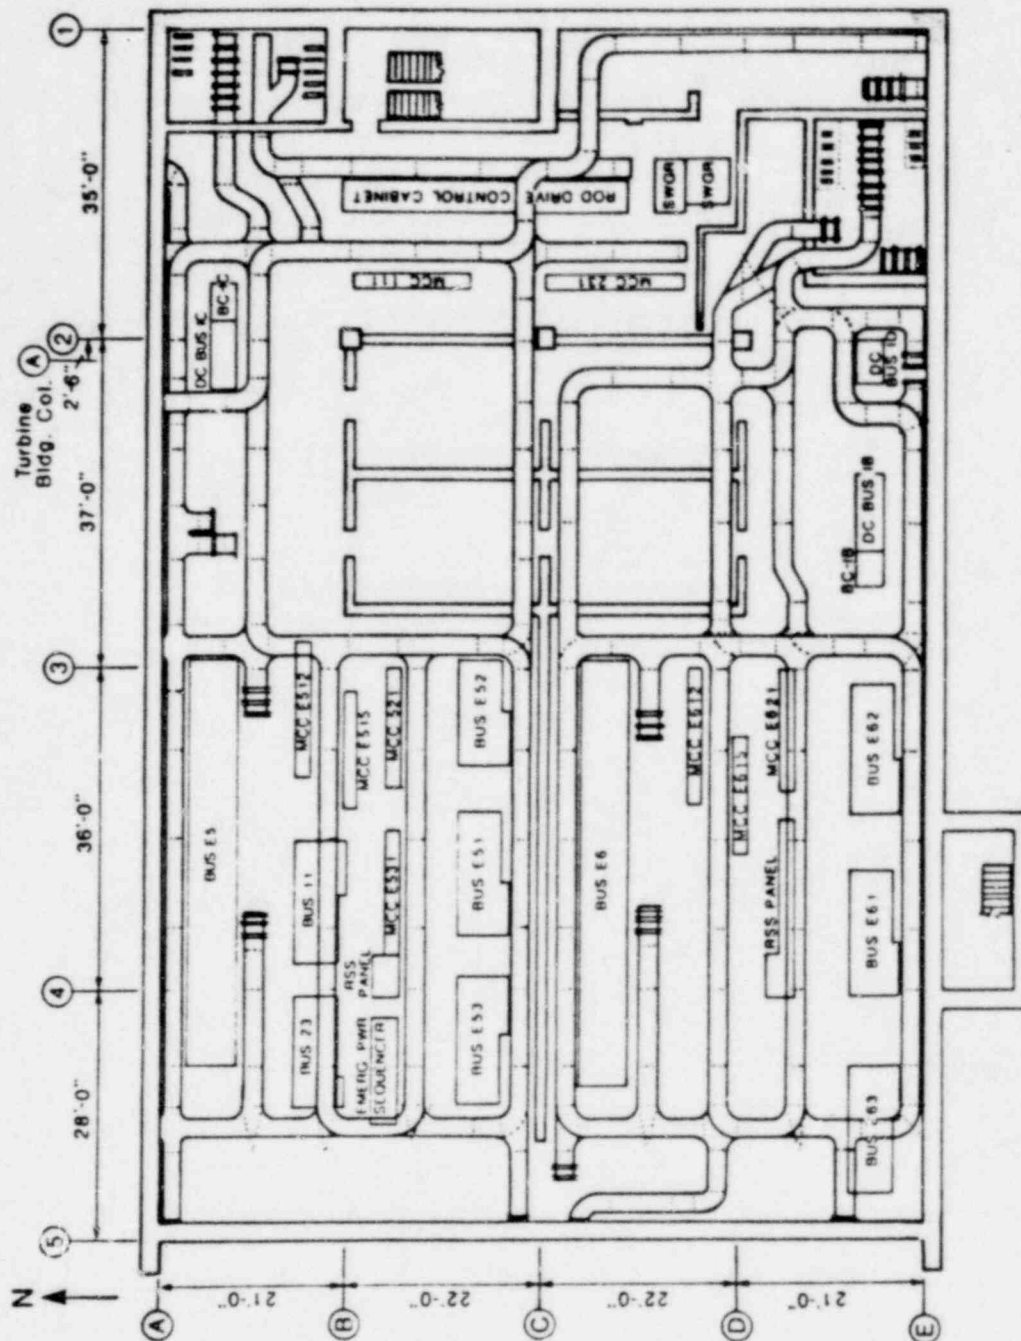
The typical configuration of cable trays in this area is a double trapeze with up to 8 tiers. The trapezes are connected to the ceiling using the standard connection "boot" either bolted or welded to overhead structural steel wide-flange beams. On multiple-tiered trays, at least every fourth tier is braced in the transverse direction. Bracing details include triangular gussets at major connections and clip angles at other connections. The cable trays are connected to the trapeze supports with either internal clips or "Z"-clips. Cable is routed from the tray into electrical busses through wireways and flexible conduit.
